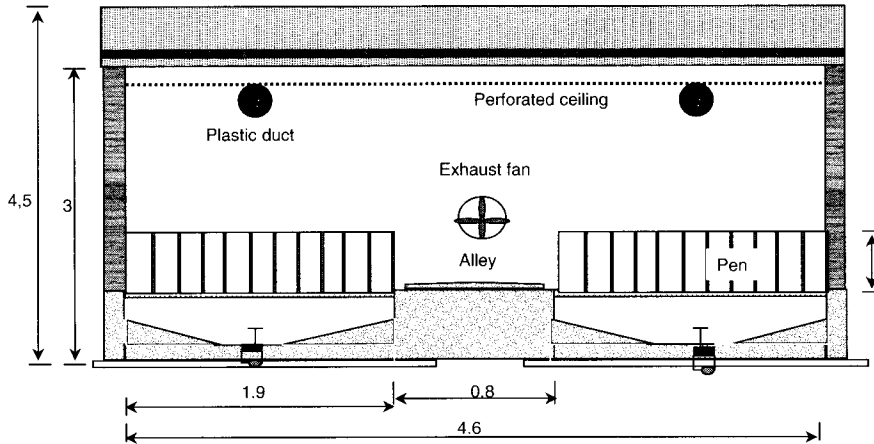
X-sectional view(Y-Z) and dimension of the enclosed nursery pig bay(meters).
